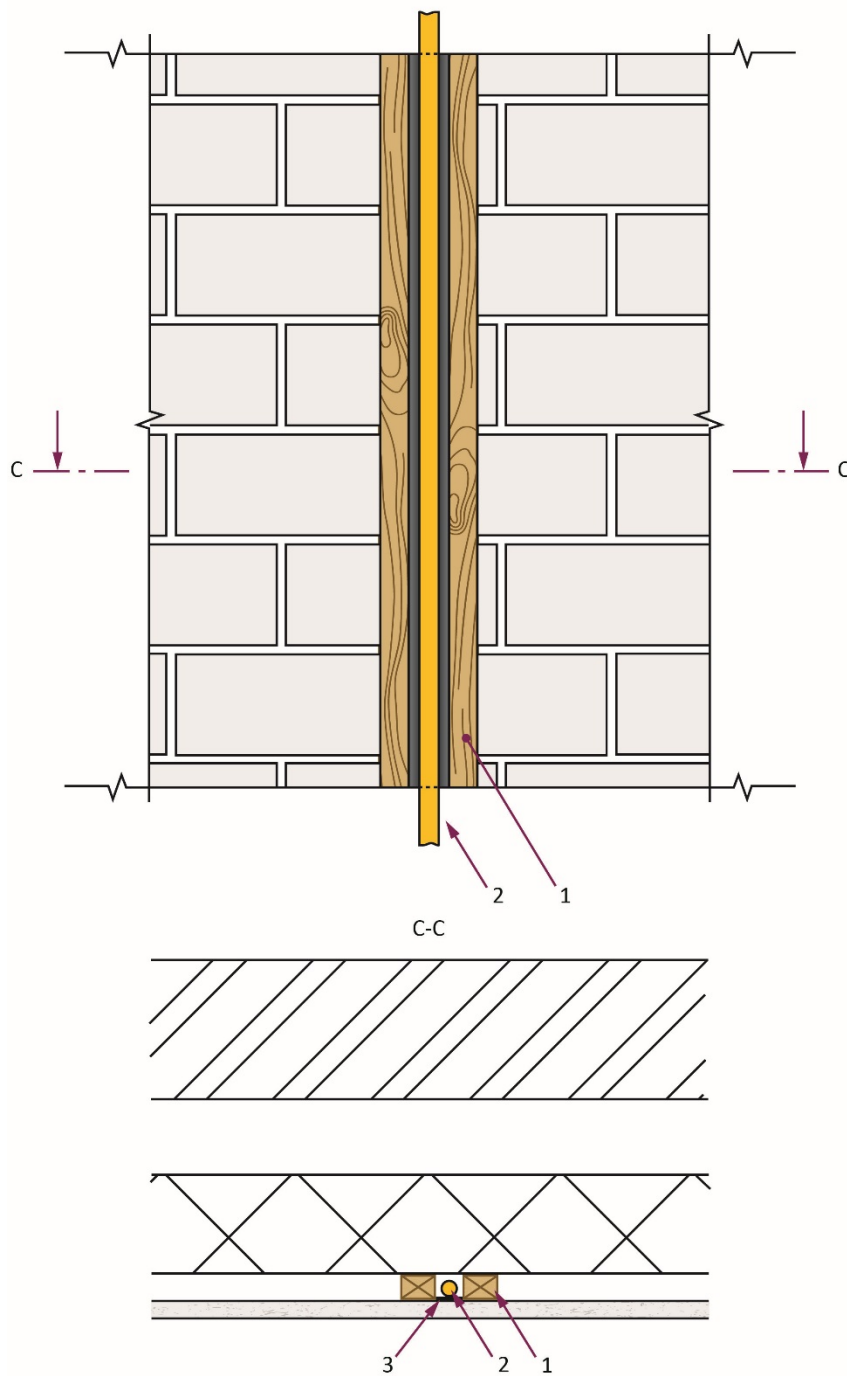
Typical example of TracPipe® installed in masonry construction wall (Brick and Block with dry lining on dabs)
